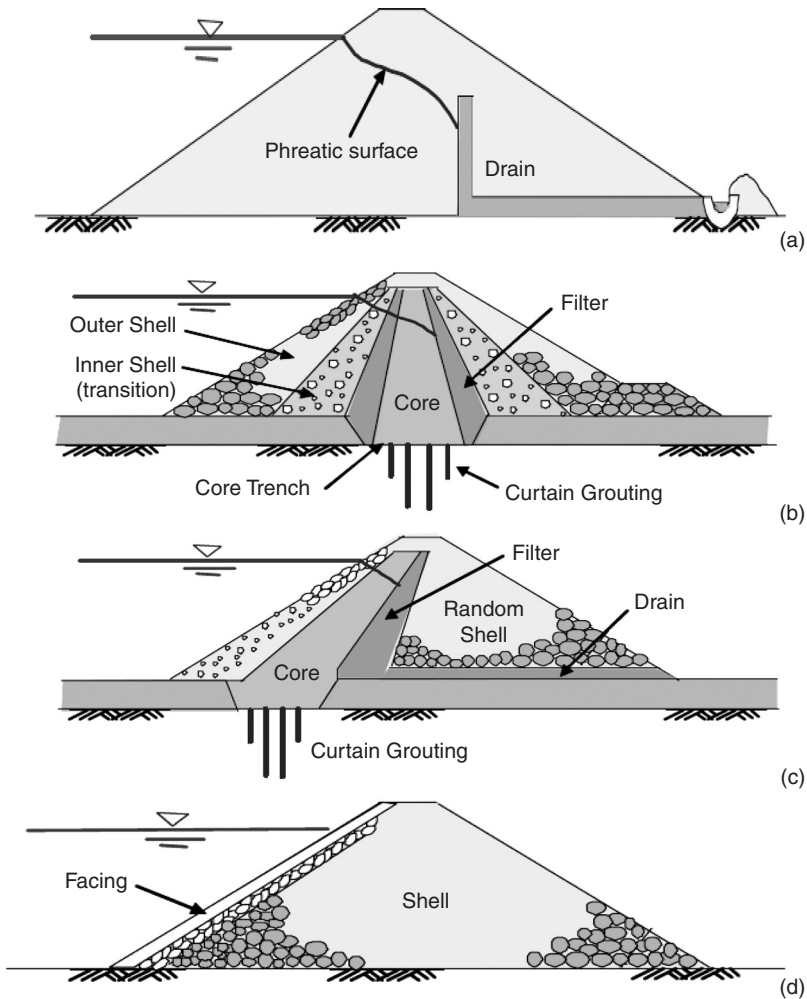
(a) Homogeneous earth dam; (b) rockfill dam with a centrally located core; (c) rockfill dam with an inclined core; (d) rockfill dam with a facing (after [5]).
